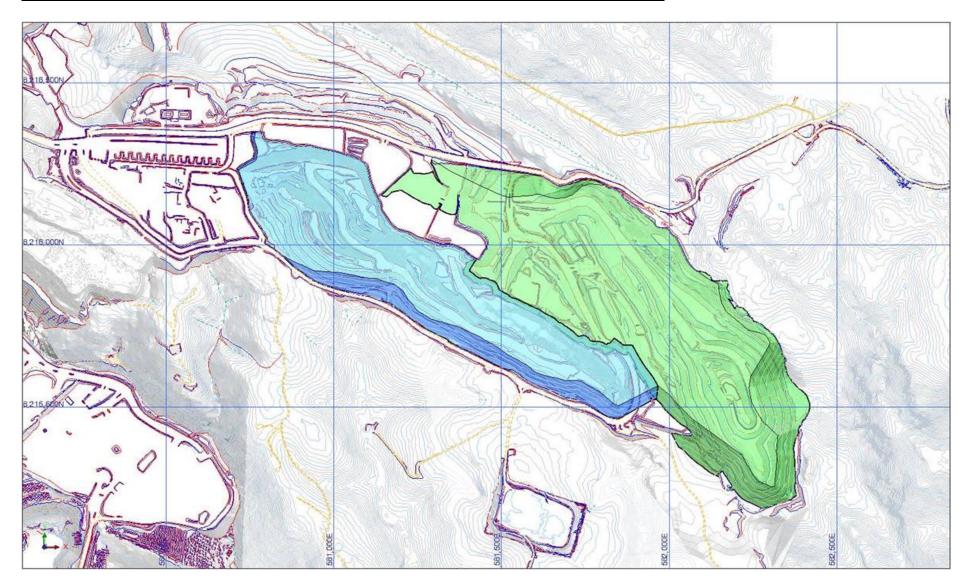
Current Approved WD4 and East Pit Backfill Landform Design (green). Blue is a design option for proposed Barramundi Pit backfill
